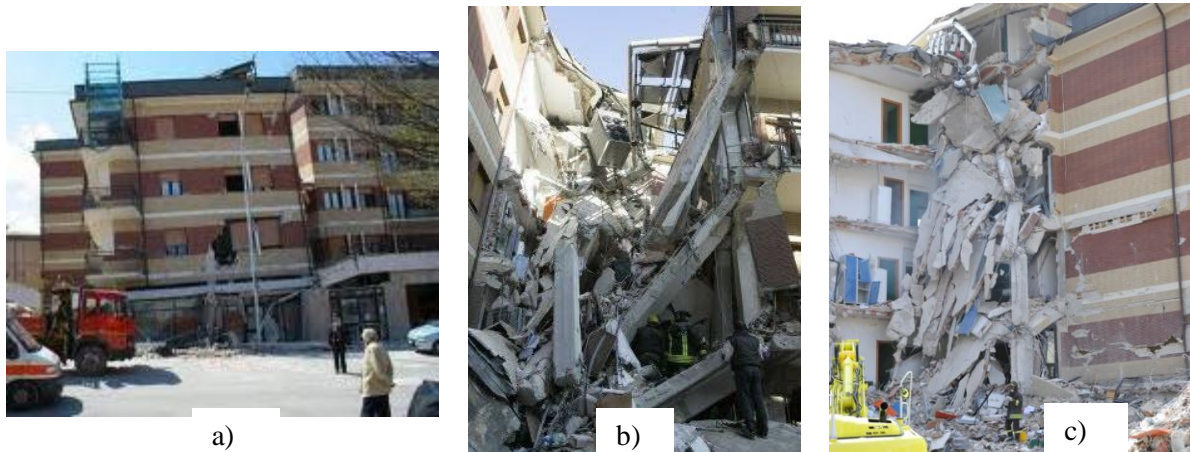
North Wing Collapse : a) North view; b) connection zone; c) demolition before removal of col. 29.
